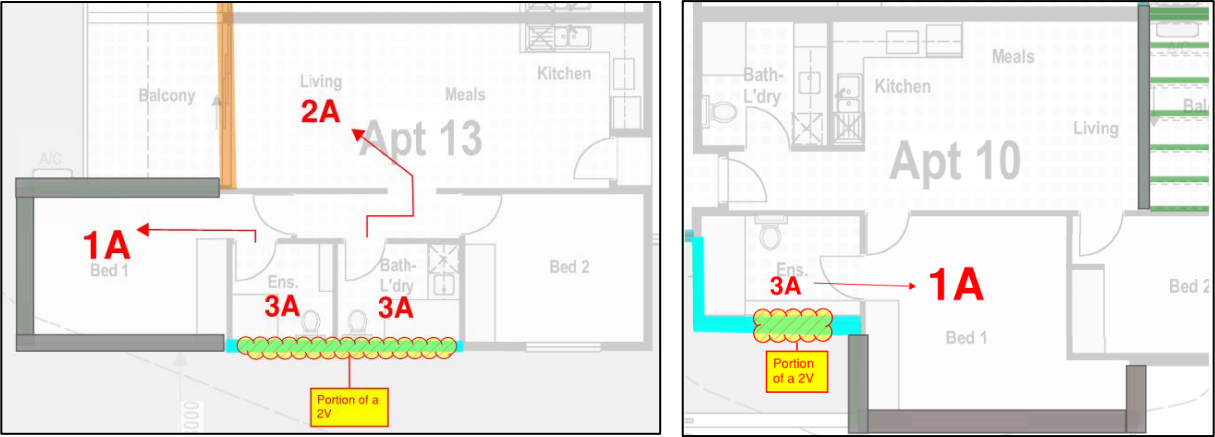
The rooms that these 3A's are adjoined to become type A's as they now have a greater risk of being impacted by fire
